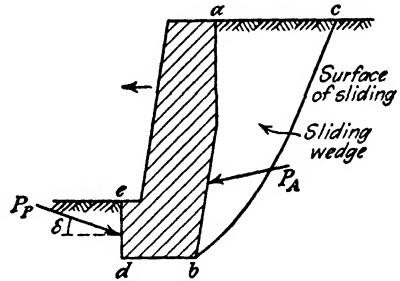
Earth pressures acting on retaining wall at instant of failure.
